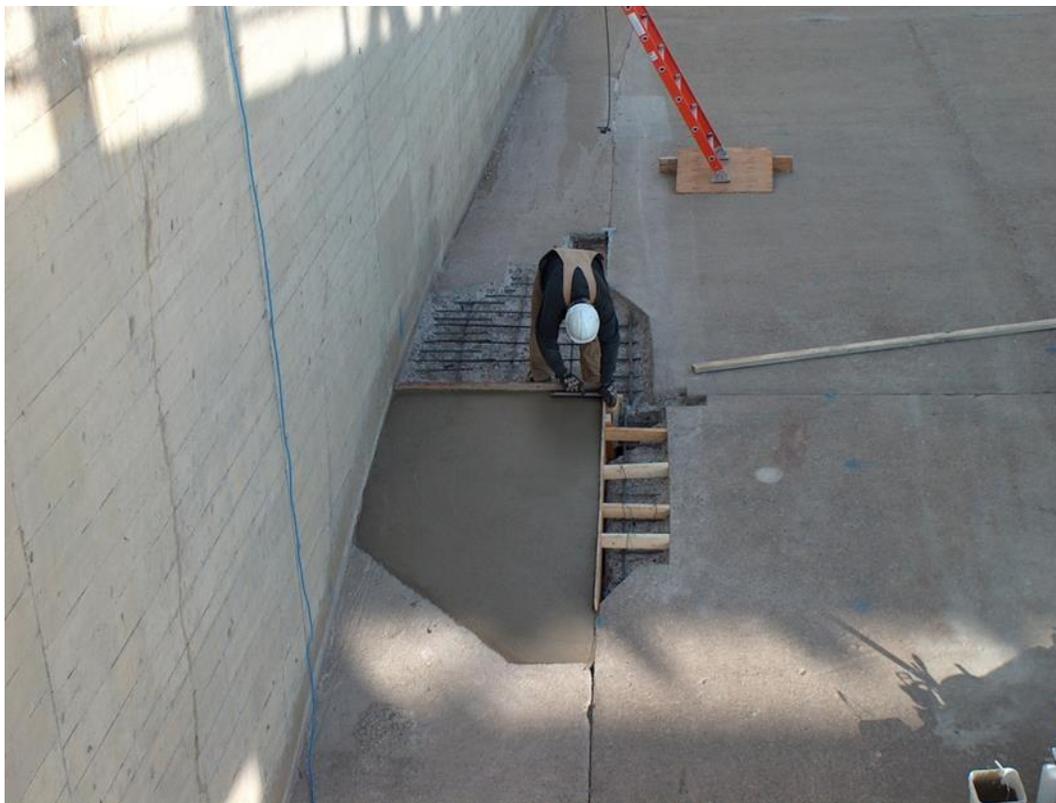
Formwork used to maintain the existing joints in a spillway floor repair.
